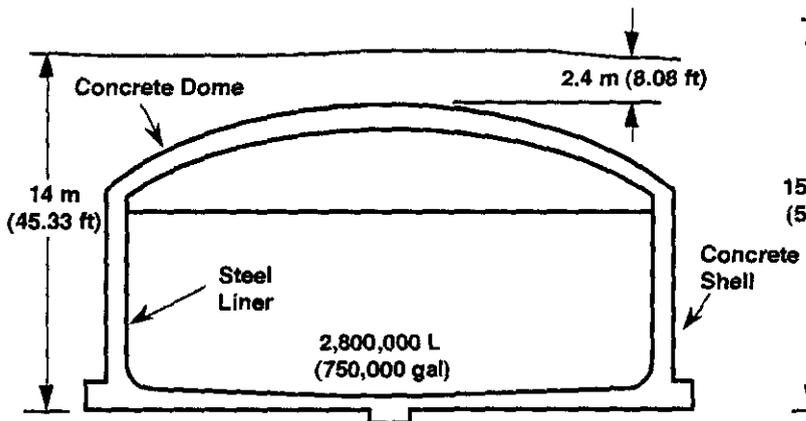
Cross-Sectional Views of Hanford Site Single-Shell Tanks
